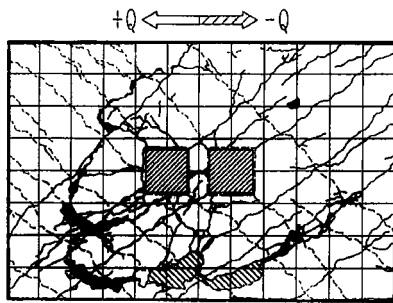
Example of final cracking pattern at the web wall (P3-4)
